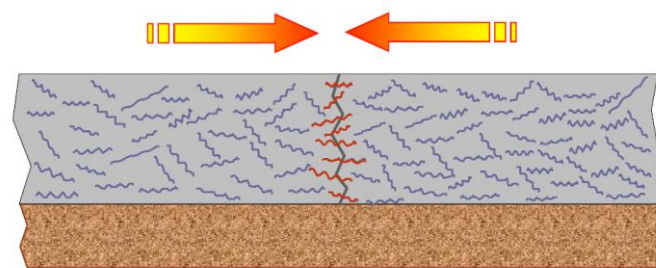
Continuous crack restraint by SFRC in pavement
